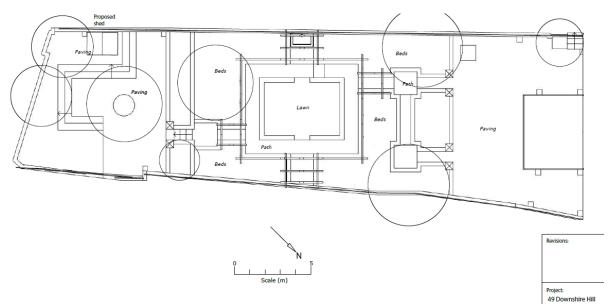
Proposed garden layout, with proposed shed located in top left corner.
